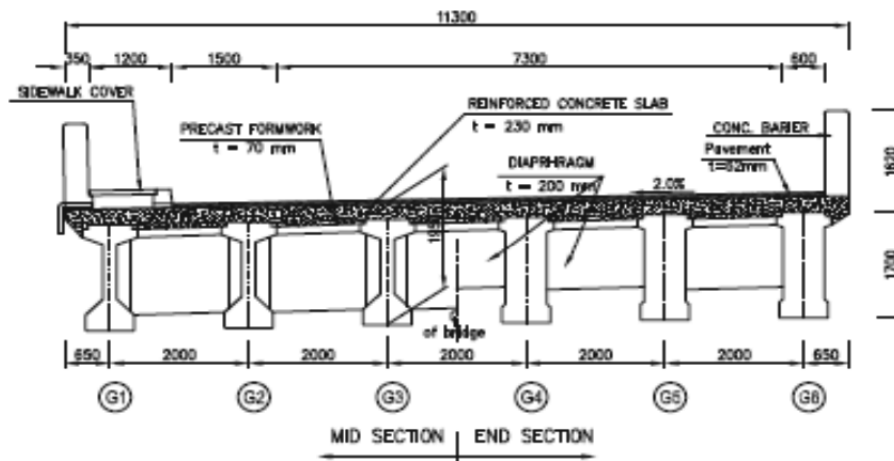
PC-I Girder with Chaired Pier Head
